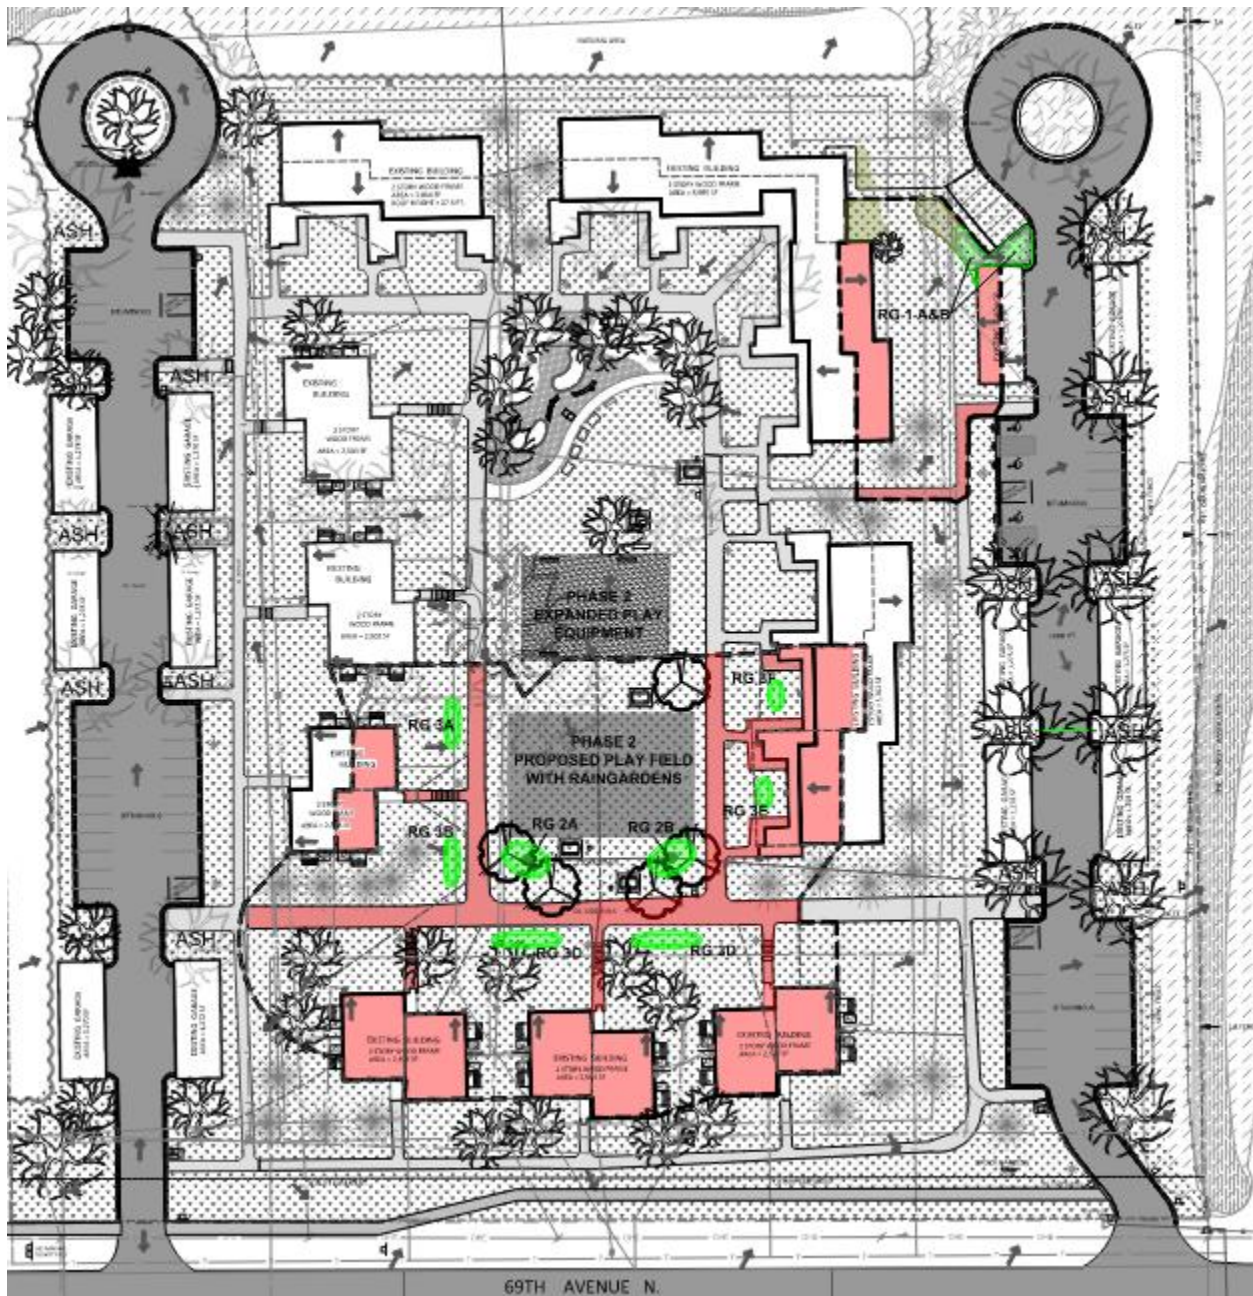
Proposed project. Impervious to be treated shown in pink; light green shows the proposed new rain gardens.
